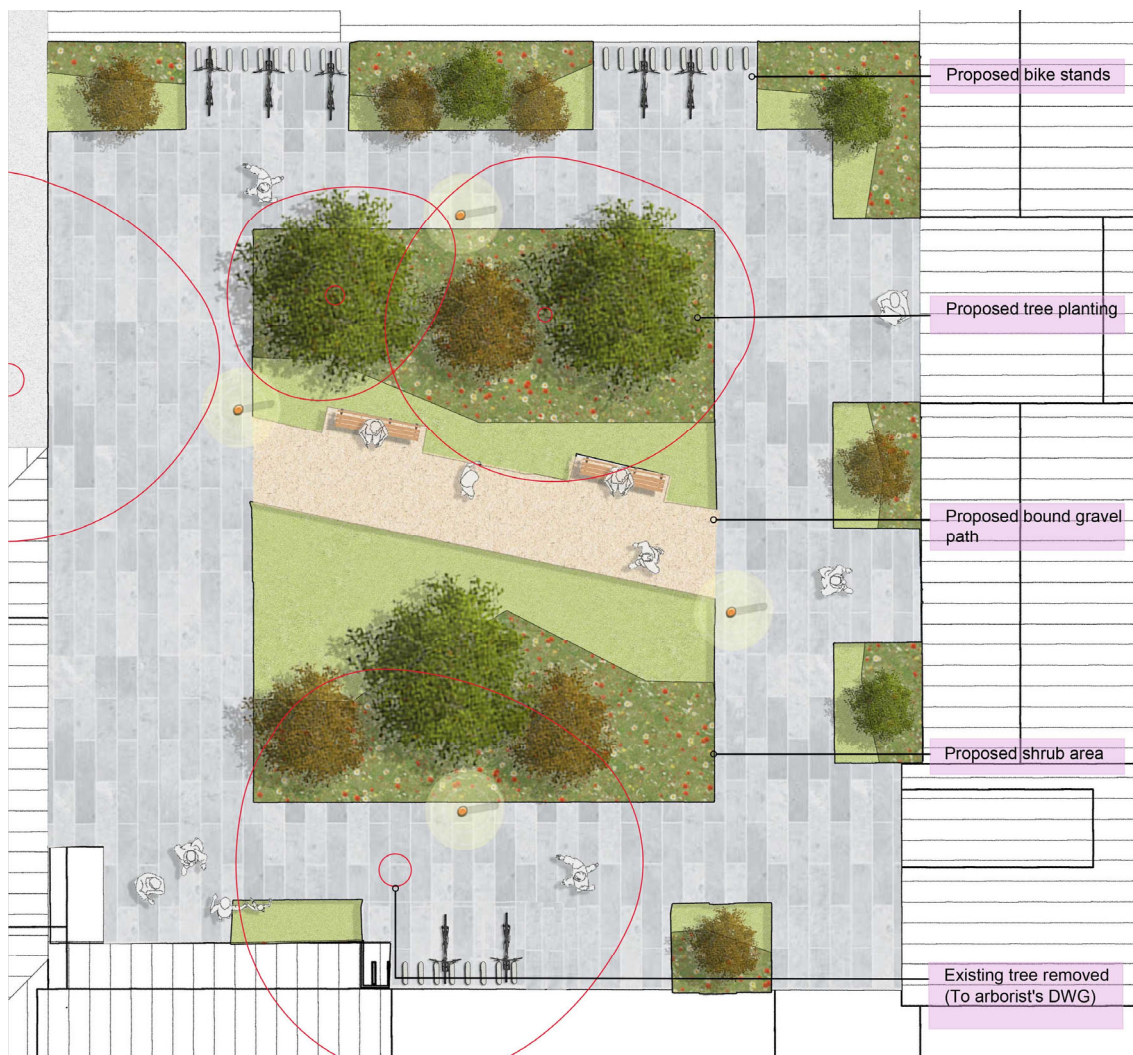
Plan view of the proposed Neighbourhood Centre courtyard space.
